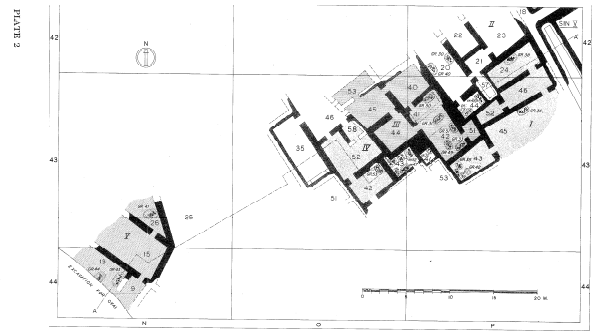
Plan of Early Dynastic building at Tell Madhur
